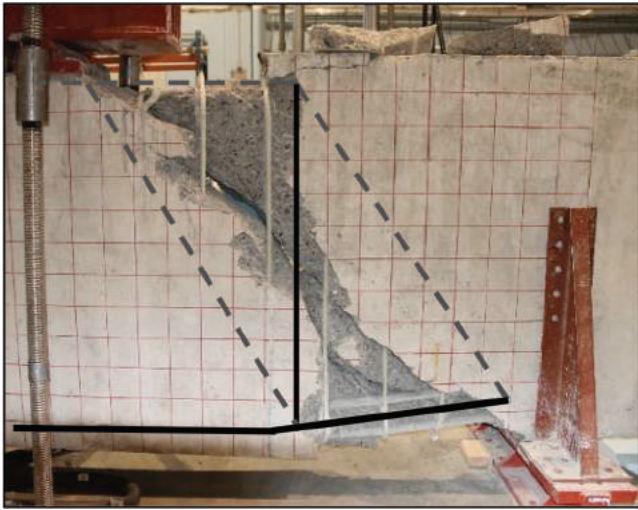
Formation of two-panel STM in tested deep beams with vertical stirrups.
